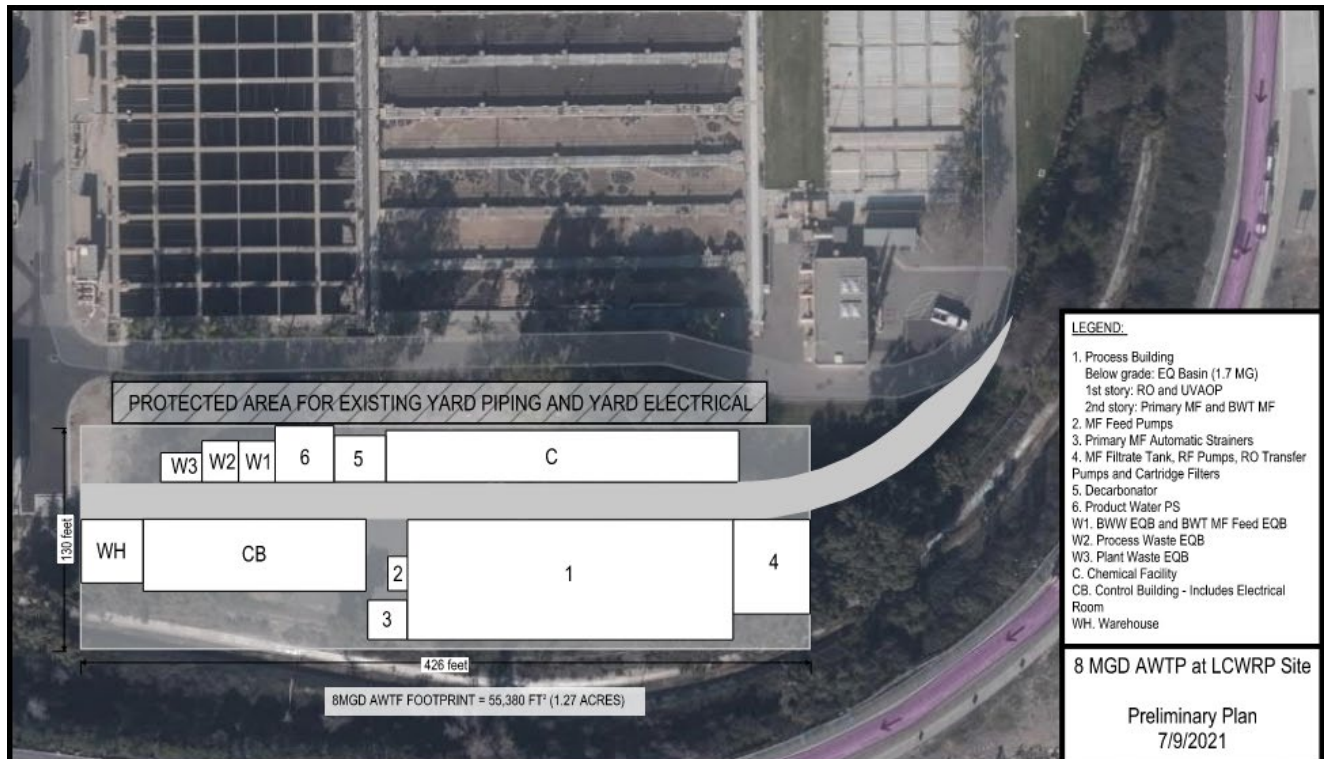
New Advanced Water Treatment Plant at the Los Coyotes Water Reclamation Plant Site
